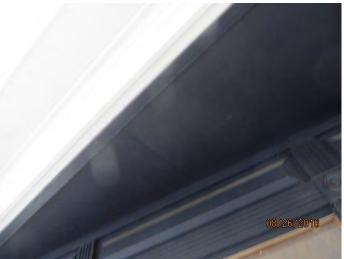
Drops on sidewalk second water leak at vestibule at 11:18 AM
